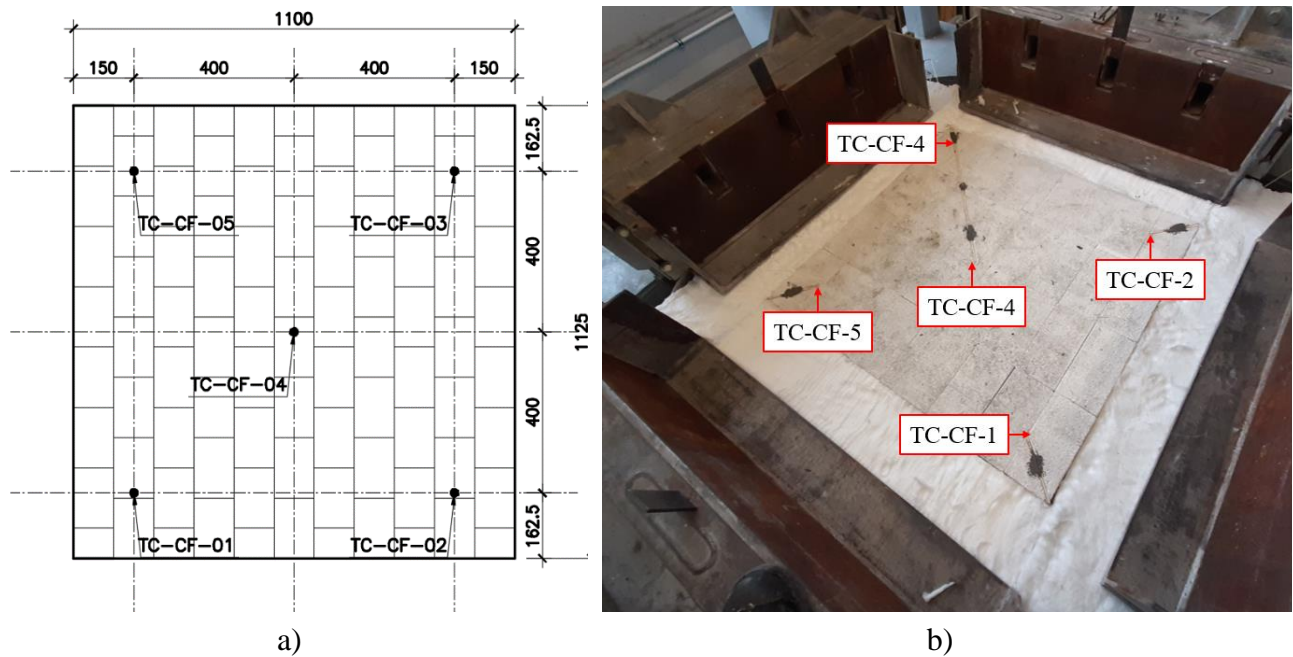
Thermocouples of cold face: a) Location; b) Details
